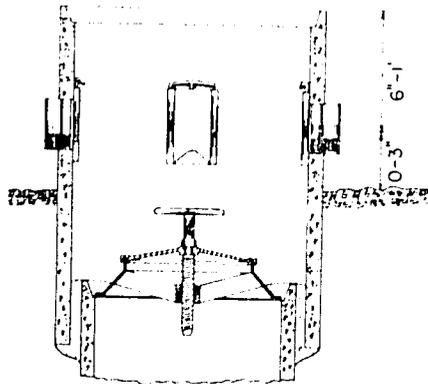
Open-pot hydrant with orchard valve and slide gate control (4).
